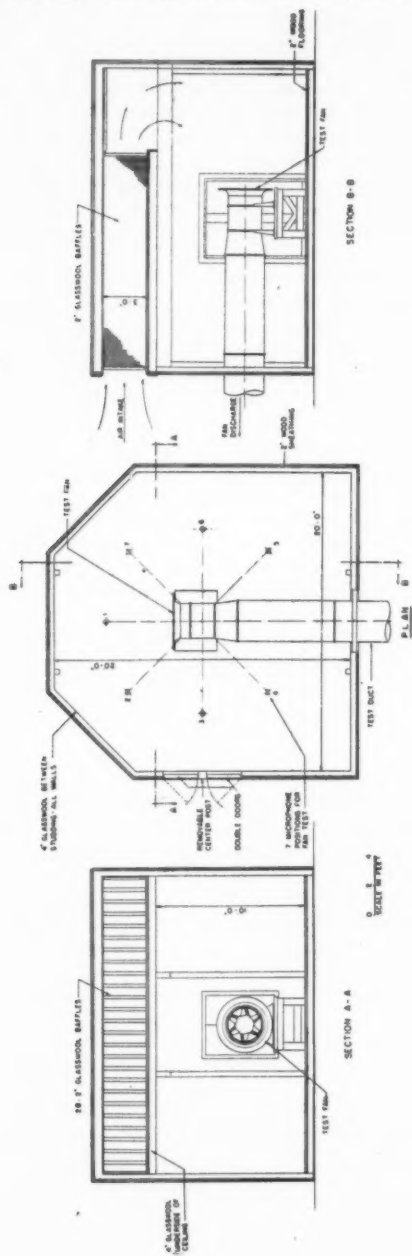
PLAN AND SECTIONAL ELEVATIONS OF FAN TEST ROOM
